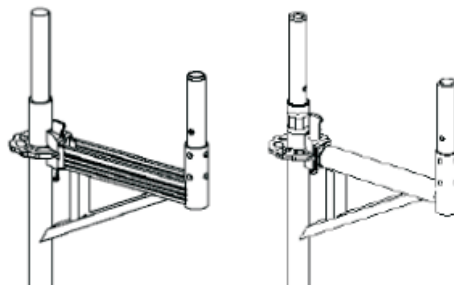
Side brackets with mounting on the channel bar and pipe
